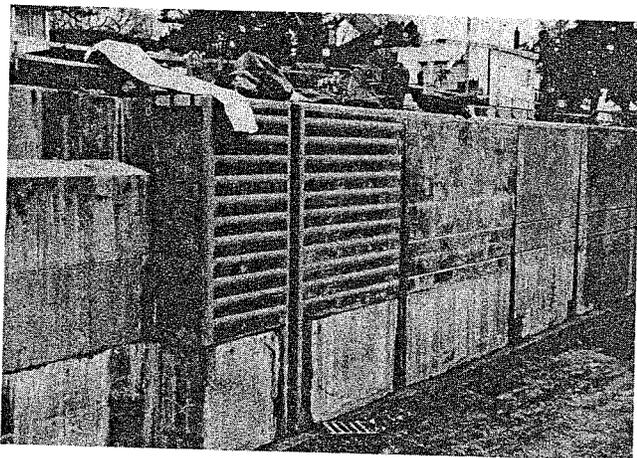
Wall armor embedded in lock wall to minimize the effects of abrasion and impact
